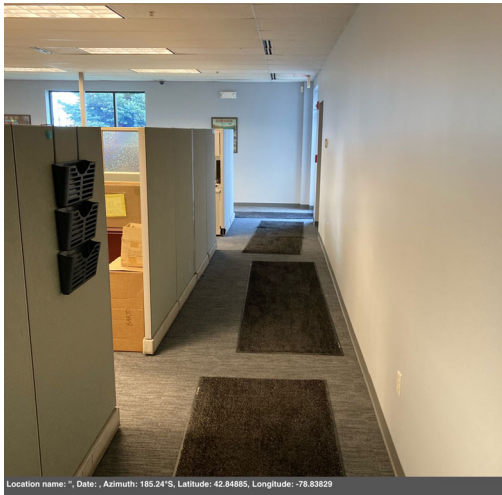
Carpeting placed over office linoleum hallway (March 2024)
